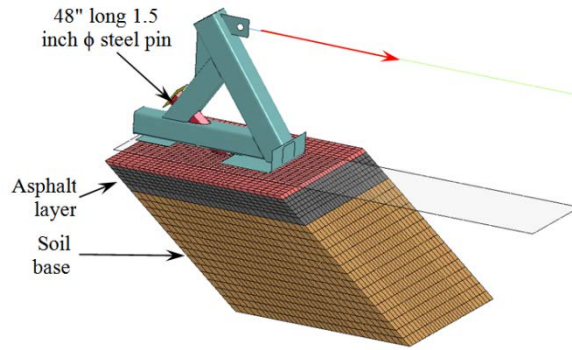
Finite element model of anchoring pin installed in asphalt pad and soil base.
